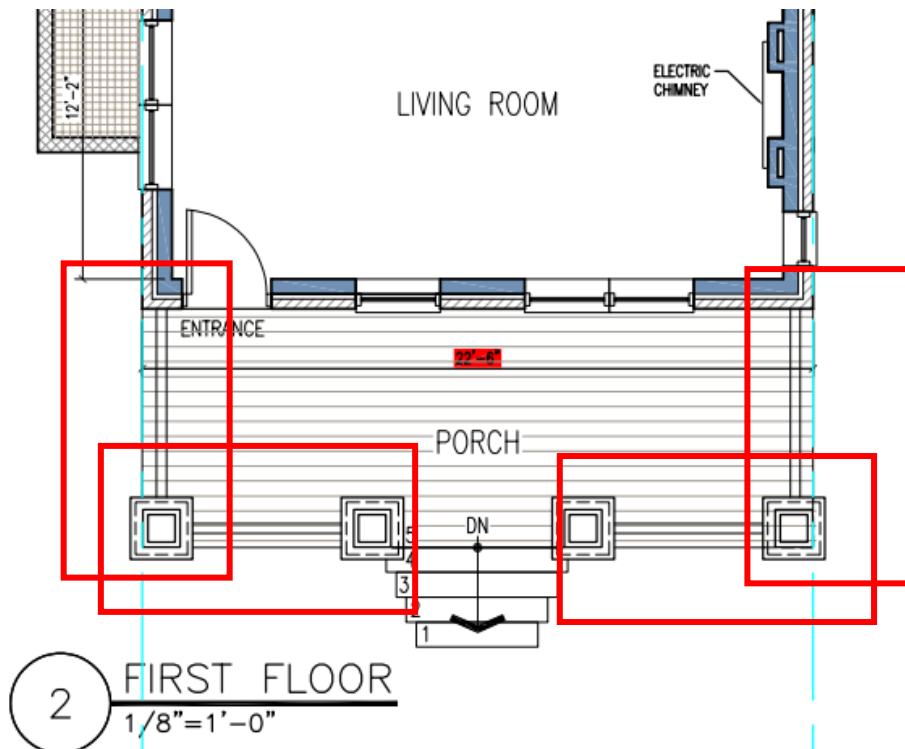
Figure D: First Floor Plan Indicating Porch Railing at Front and Sides of Porch
